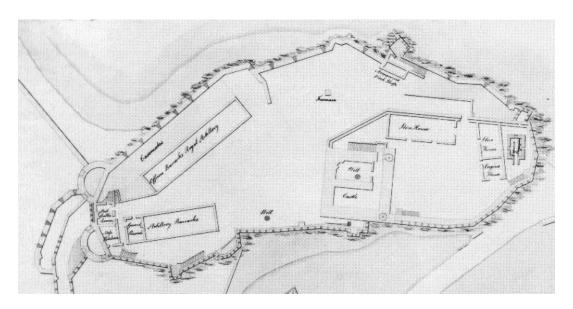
Detail of Carrickfergus Castle from 1811 plan (PRO wo 78/1158).
